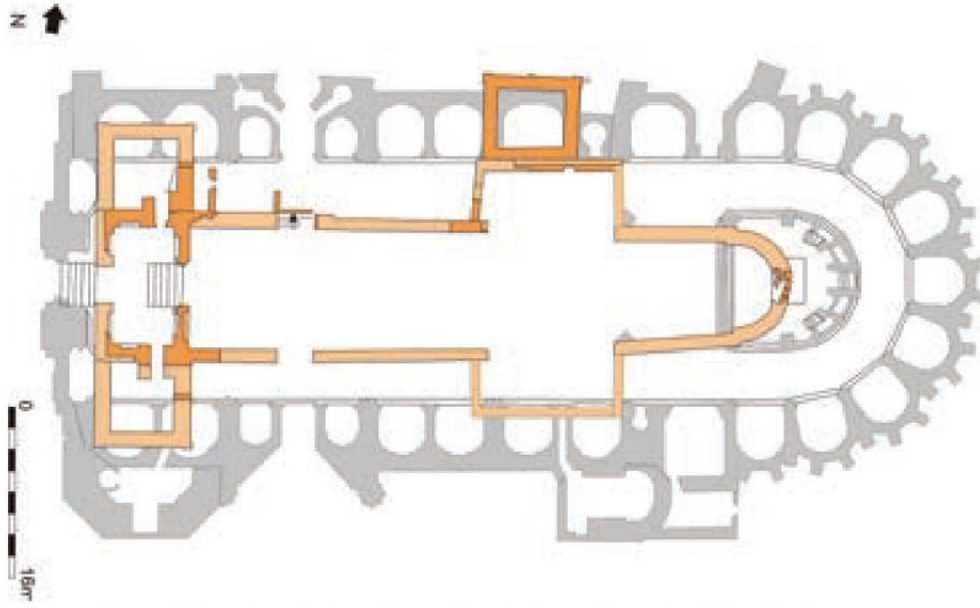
Girona (E), restituted plan of Saint Mary's. Grey: Gothic building. Dark orange: excavated structures. Light orange: restituted structures (drawing Marc SUREDA I JUBANY)
